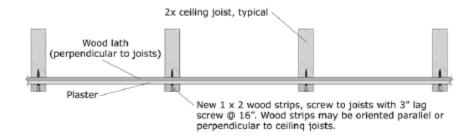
Retrofit Detail for Existing Lath and Plaster. (FEMA E-74, 2012, Reducing the Risks of Nonstructural Earthquake Damage)
